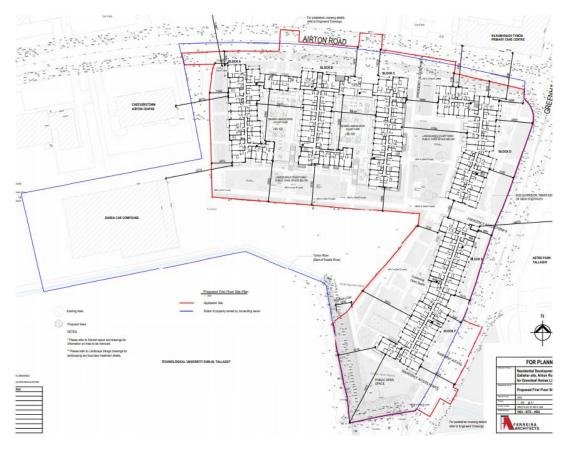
First floor layout plan approved under ABP Ref. ABP-306705-20
